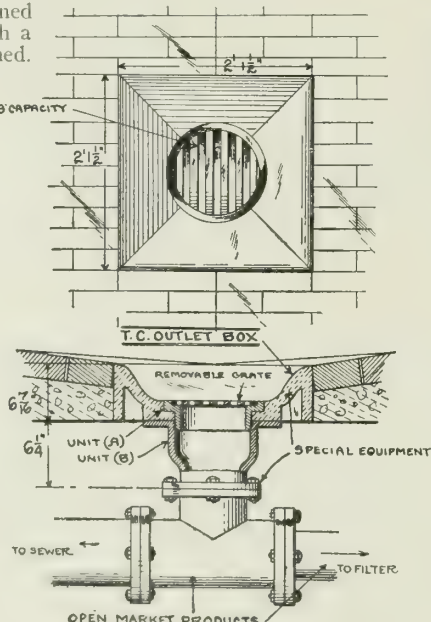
HORIZONTAL BOTTOM OUTLET UNIT AND FITTINGS
